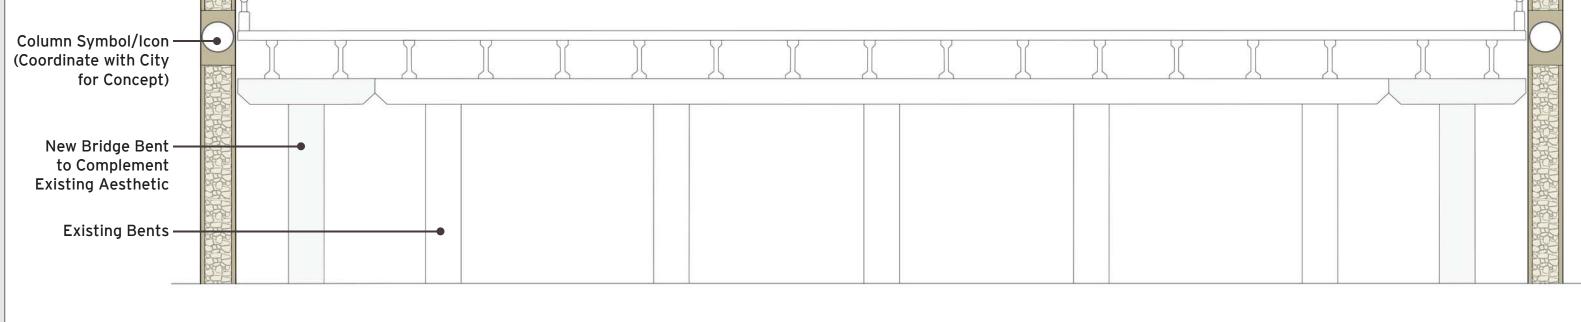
Concrete Column Treatment at Bridge Widening
